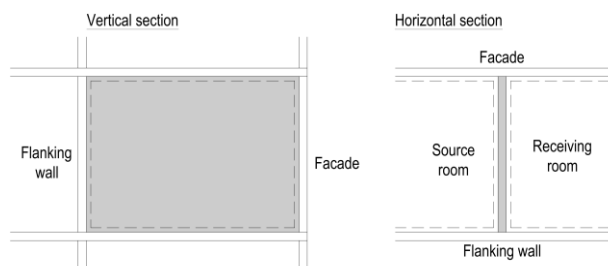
Flanking sound transmission setup. Rooms were surrounded with 140 mm thick CLT plates with rigid junctions. The grey areas represent the wall separating the rooms, and the dashed lines illustrate the ceilings, wall linings and floor coverings.
